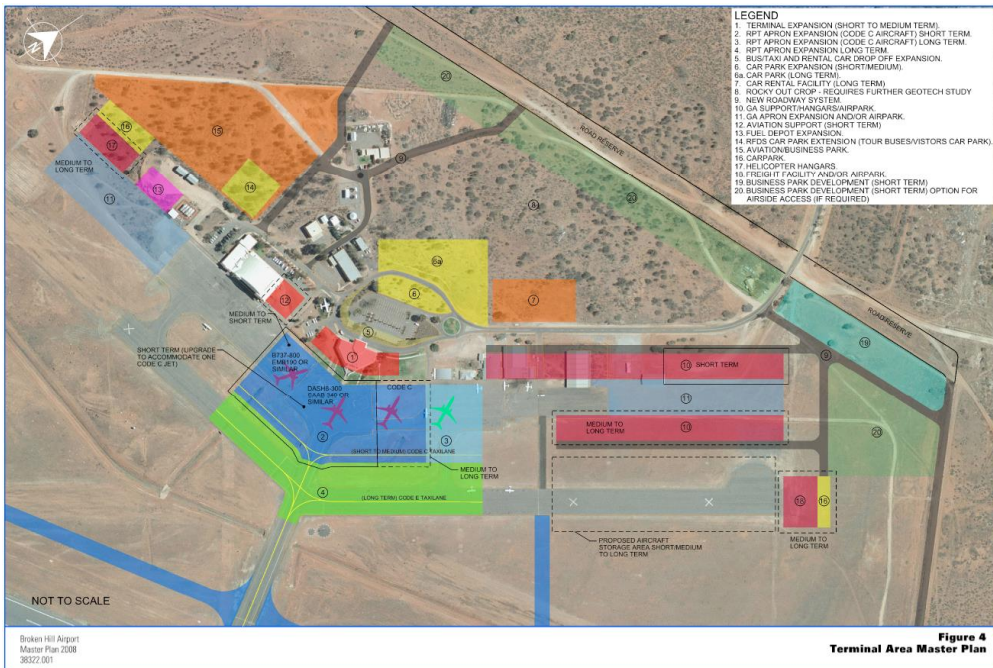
Broken Hill Airport Master Plan 2008: Terminal Area Plan³⁹.
